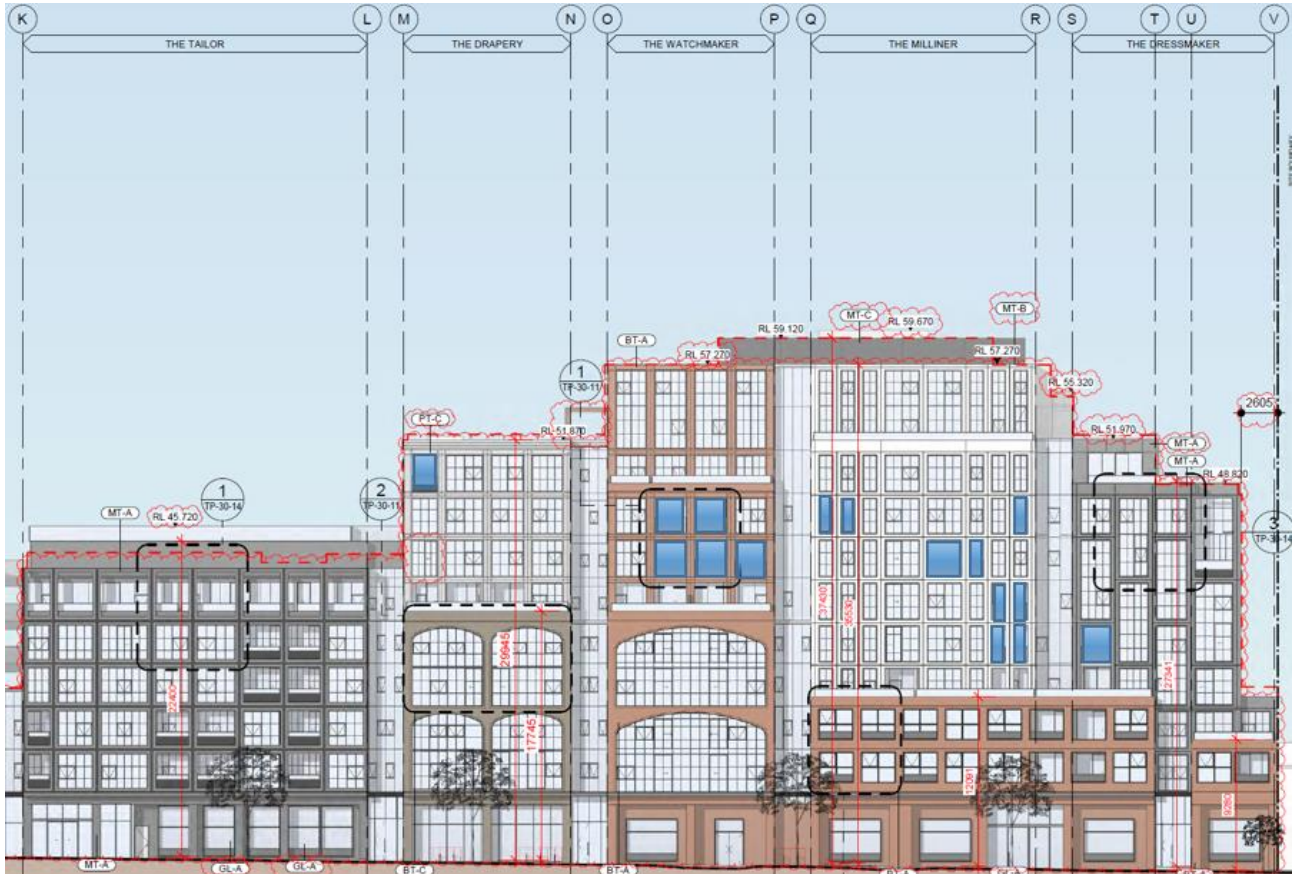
Balconies to be converted to winter gardens highlighted in blue on the east elevation (Grids K-V)
